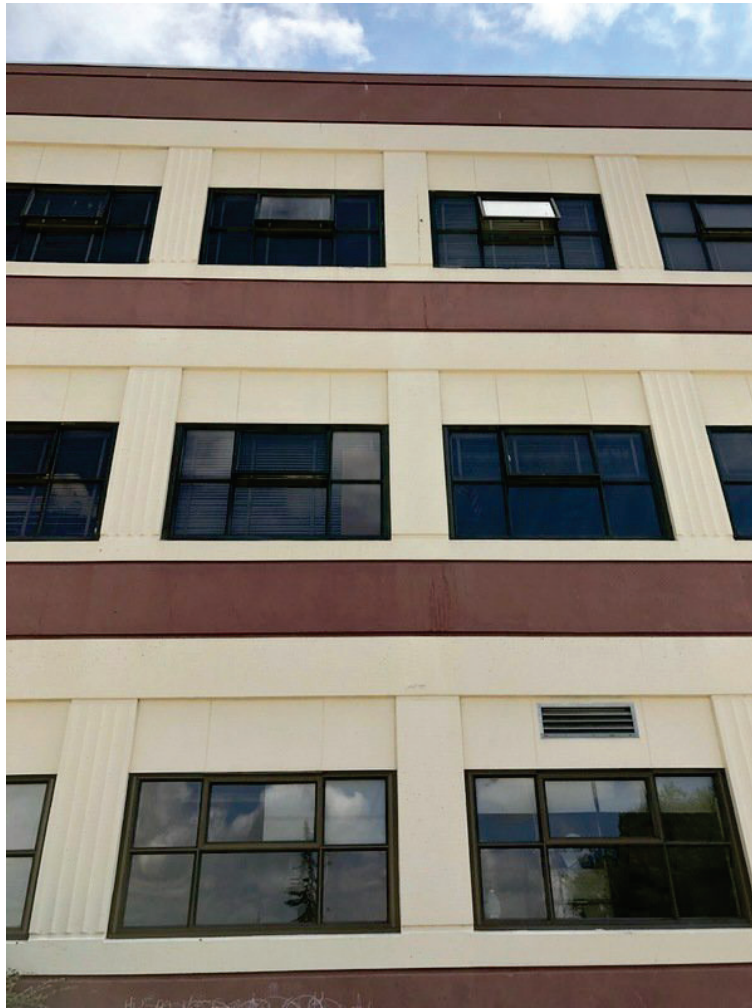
Exterior non-ductile concrete wall. Deep spandrel beams and narrow non-ductile concrete wall piers.
